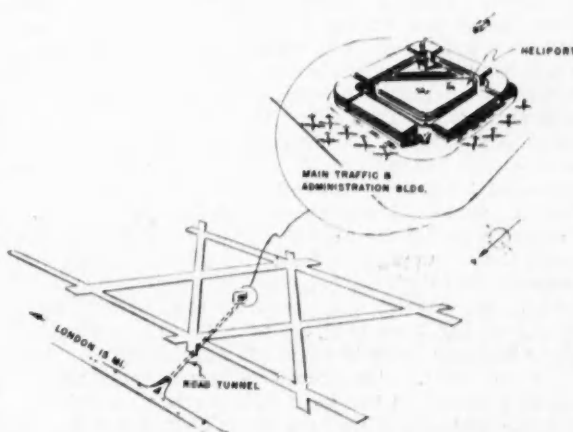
Heliport proposal for London airport—proposed heliport consists of triangular roof of central car park building. Roof has 550-ft sides and has five stories of car parking space below. Passengers will descend by elevator to ground level, where they are within 440 yd of all airplane ramps. This proposal is currently up for approval
